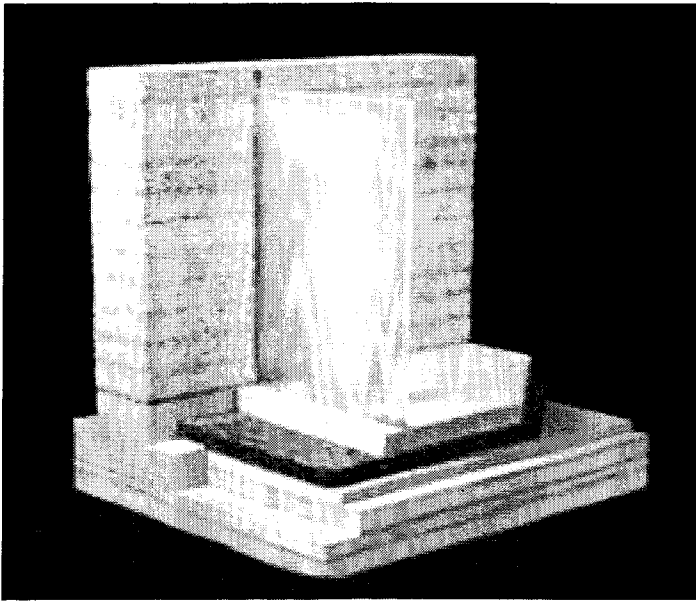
Example of Module I laboratory exercise – model of detail designed using rammed earth.
